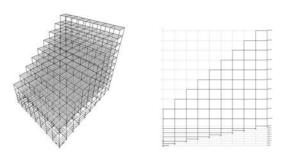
3-D View and Elevation of Set & Step back building for Storey 9 (10°Slope)
